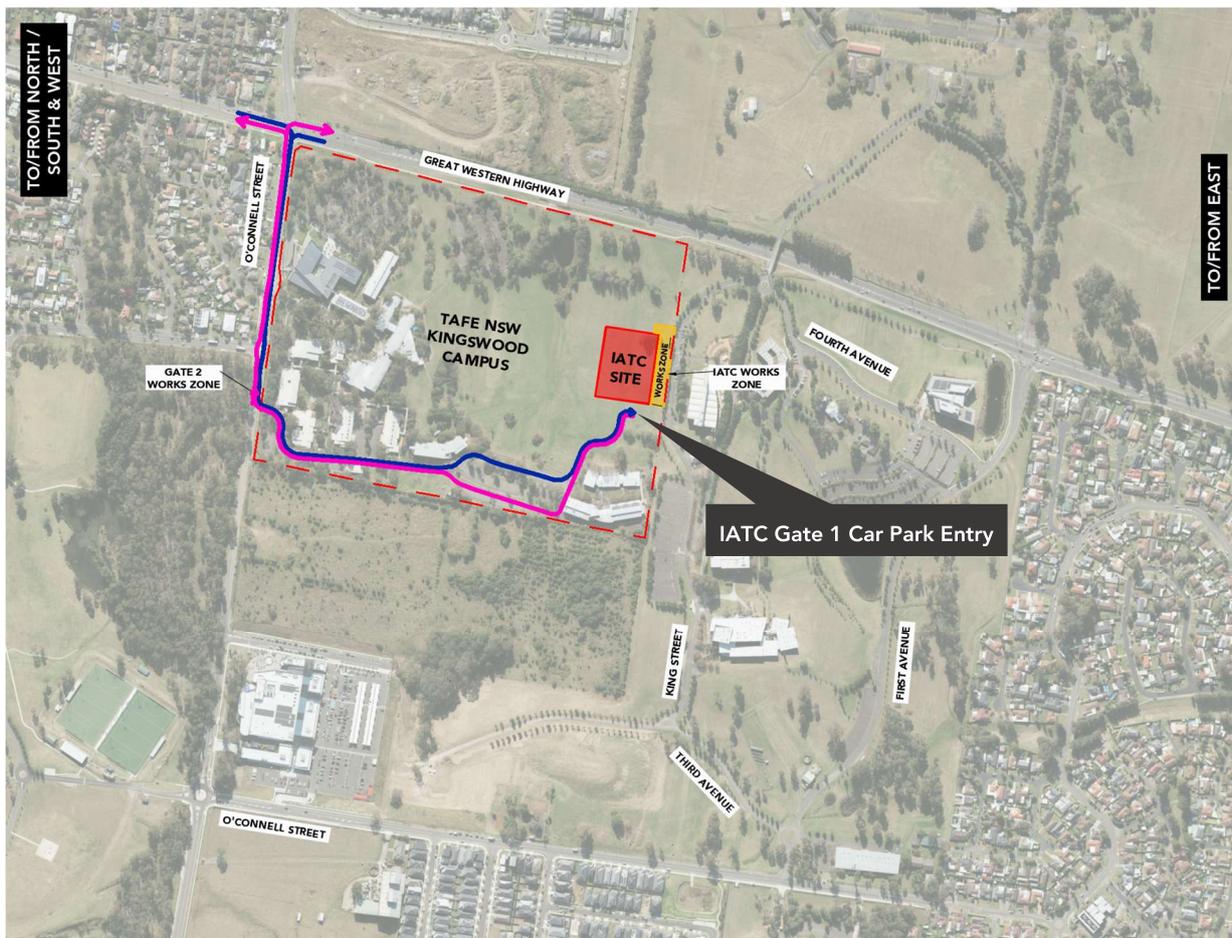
Construction Vehicle Routes (Routes 2)
